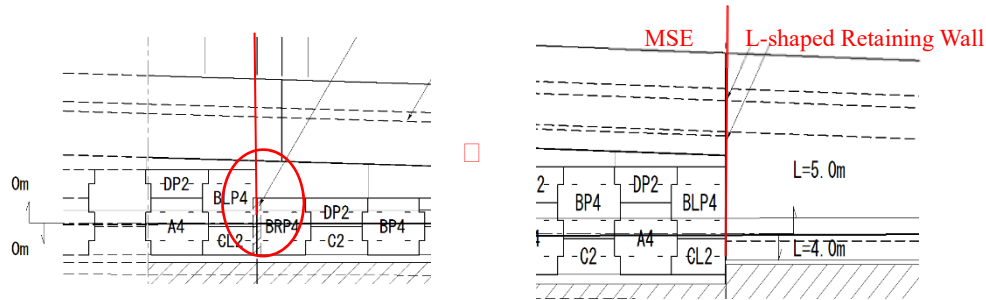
Typical Cross Section of Mechanically-stabilized Earth Wall
